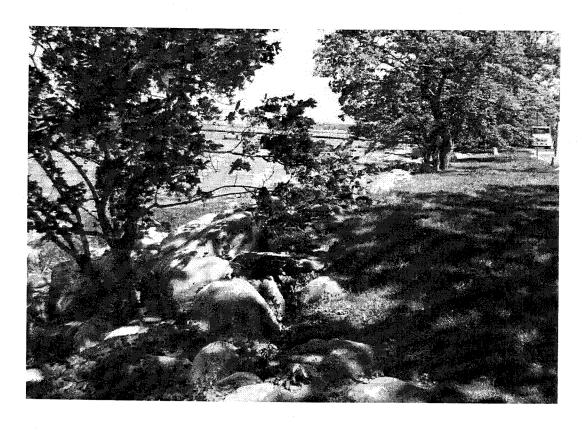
Looking north along Shore Road from midway between Manor Road and Hollywood Avenue. Collapse No. 2 is at the left (west). Outfall No. 6 location is at the foot of Manor Road, to the left (west) of the orange plastic pylon.
